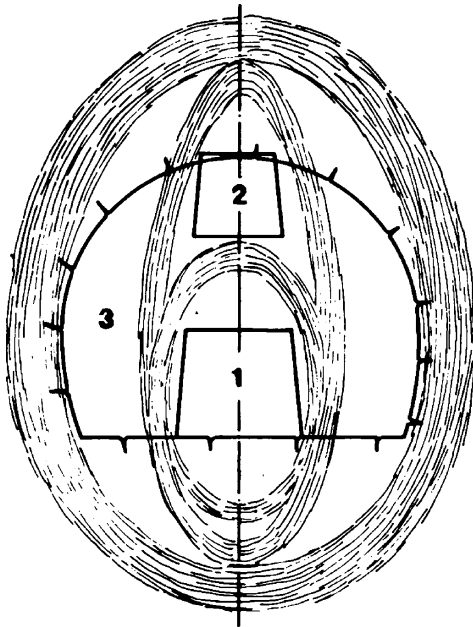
Diagram of the development of a protective envelope at various stages of excavation of a tunnel cross-section according to L. v. Rabcewicz [182].
